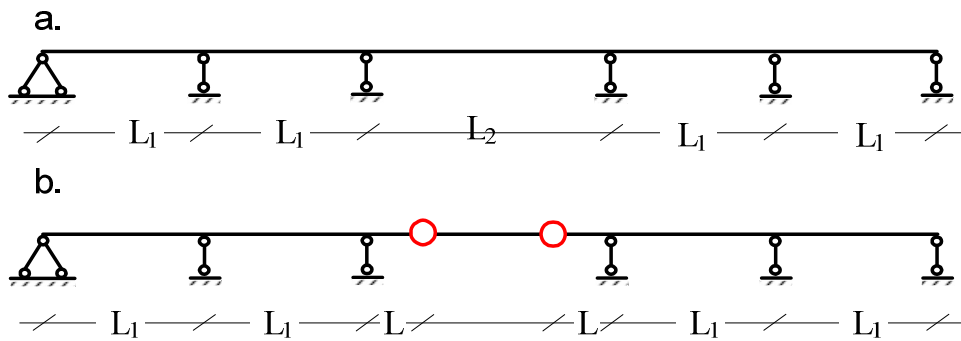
Beams used for bridge superstructures: a. continuous beam; b. continuous beam with hinges
